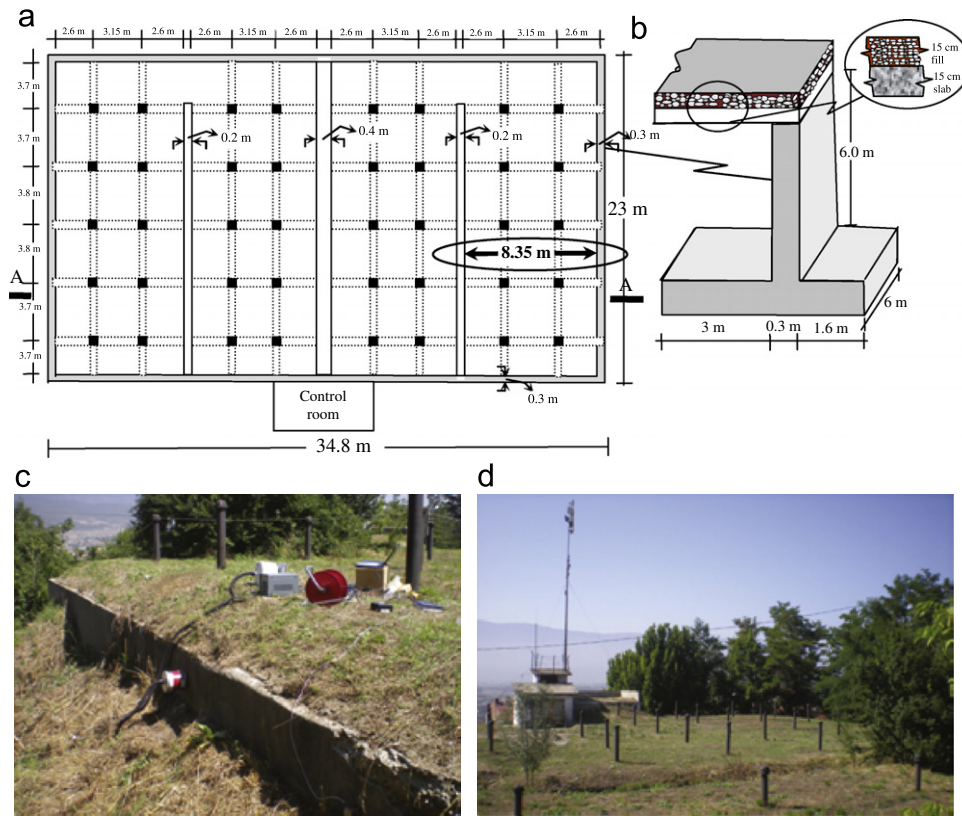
Geometrical properties and images of TANK_1 (a) plan, (b) elevation, (c) side view and (d) top view.
